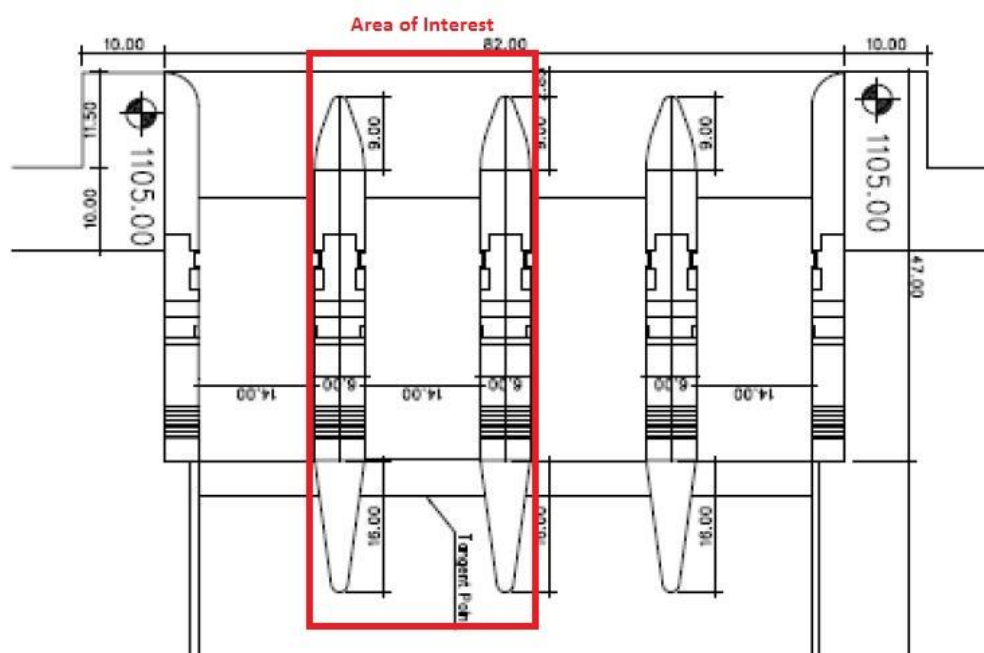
Spillway Plan of Lower Kaleköy Dam
